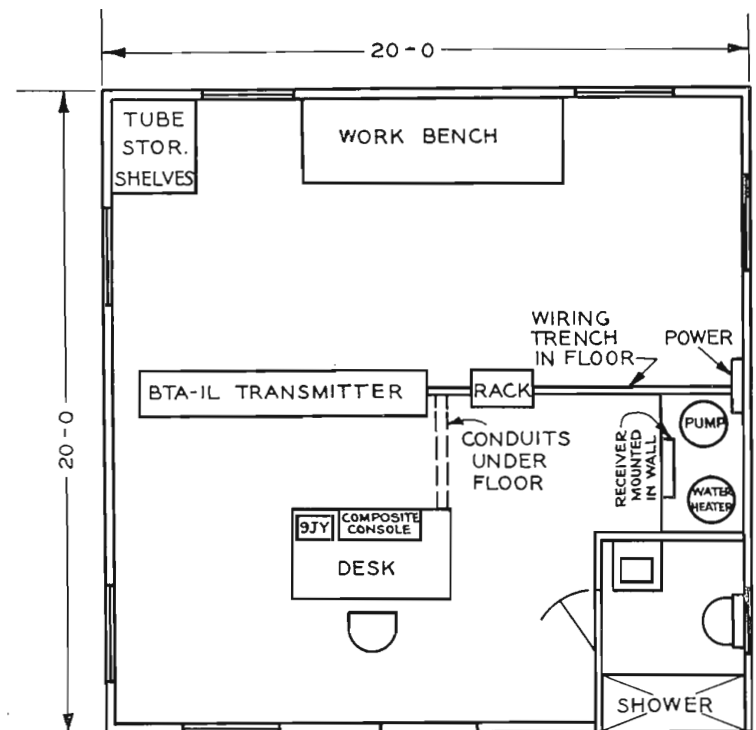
(above). The transmitter building floor plan layout. A minimum space of approximately 20 feet by 20 feet accommodates the entire transmitter plant facilities.
